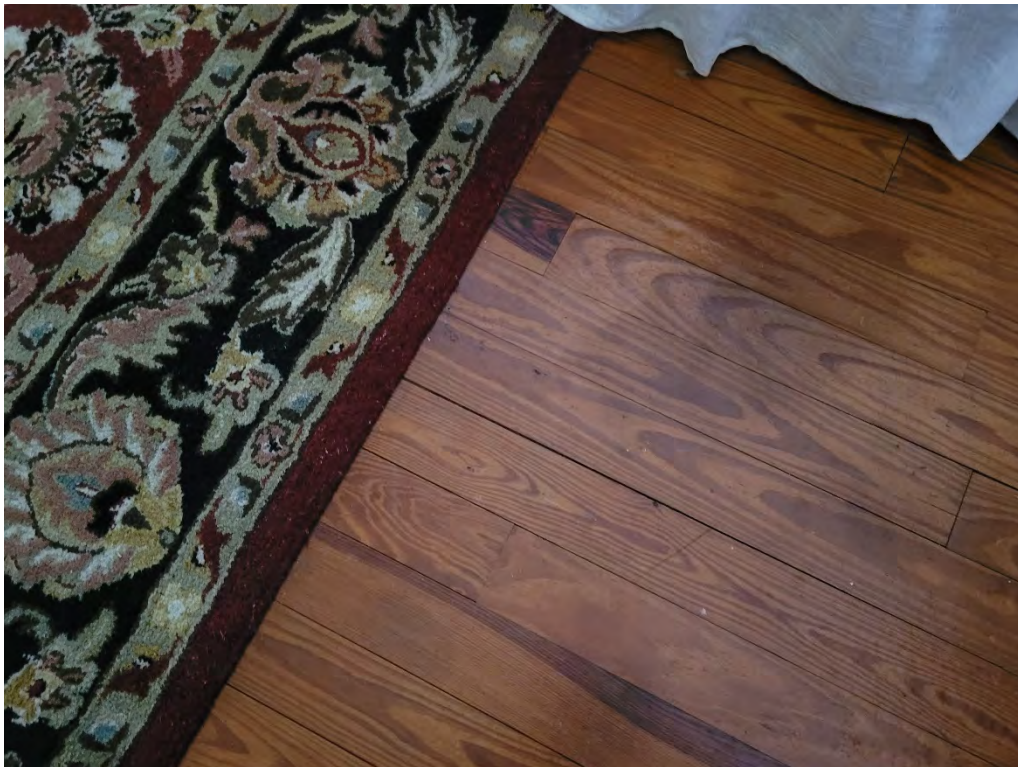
Detail of unrestored yellow pine bedroom flooring.
